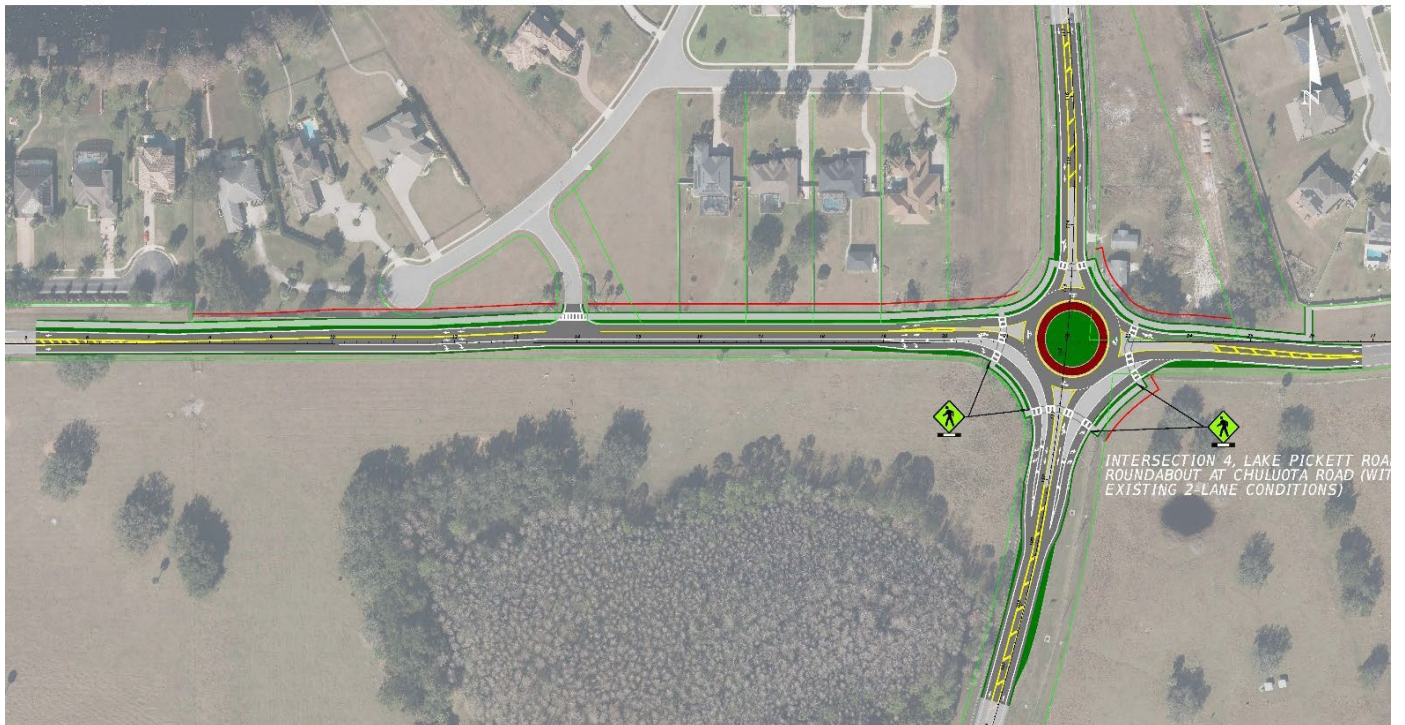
1 Roundabout Control Option at Lake Pickett Road Under No Build Conditions (Two-Lane Existing Section on Chuluota Road)
